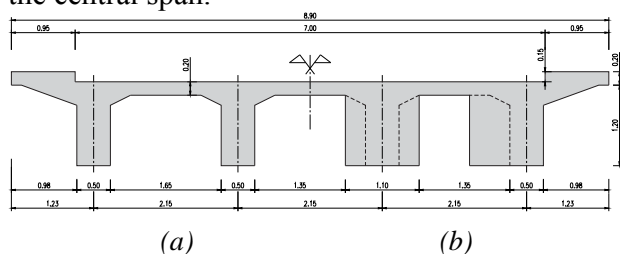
Bridge deck cross section: (a) at mid-span and; (b) over supports.
